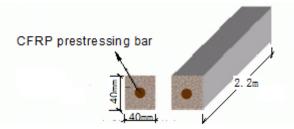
Typical CFRP prestressed concrete prism(PCP)
